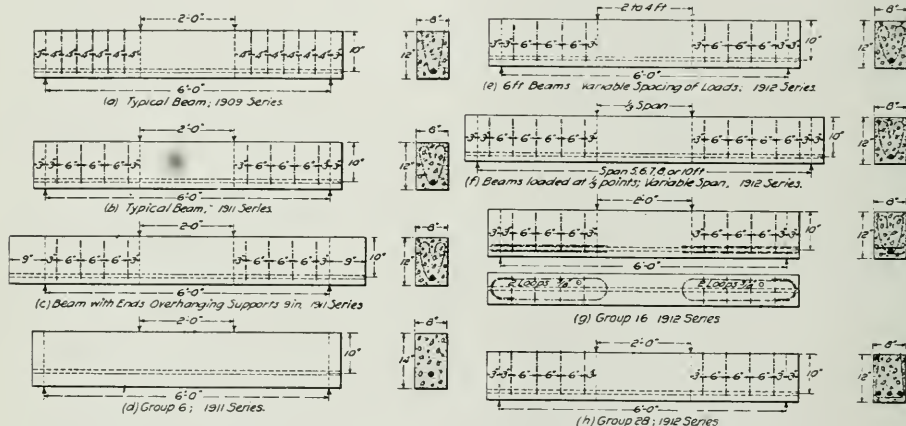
Typical Forms of Reinforced Concrete Beams Used in the Tests.
